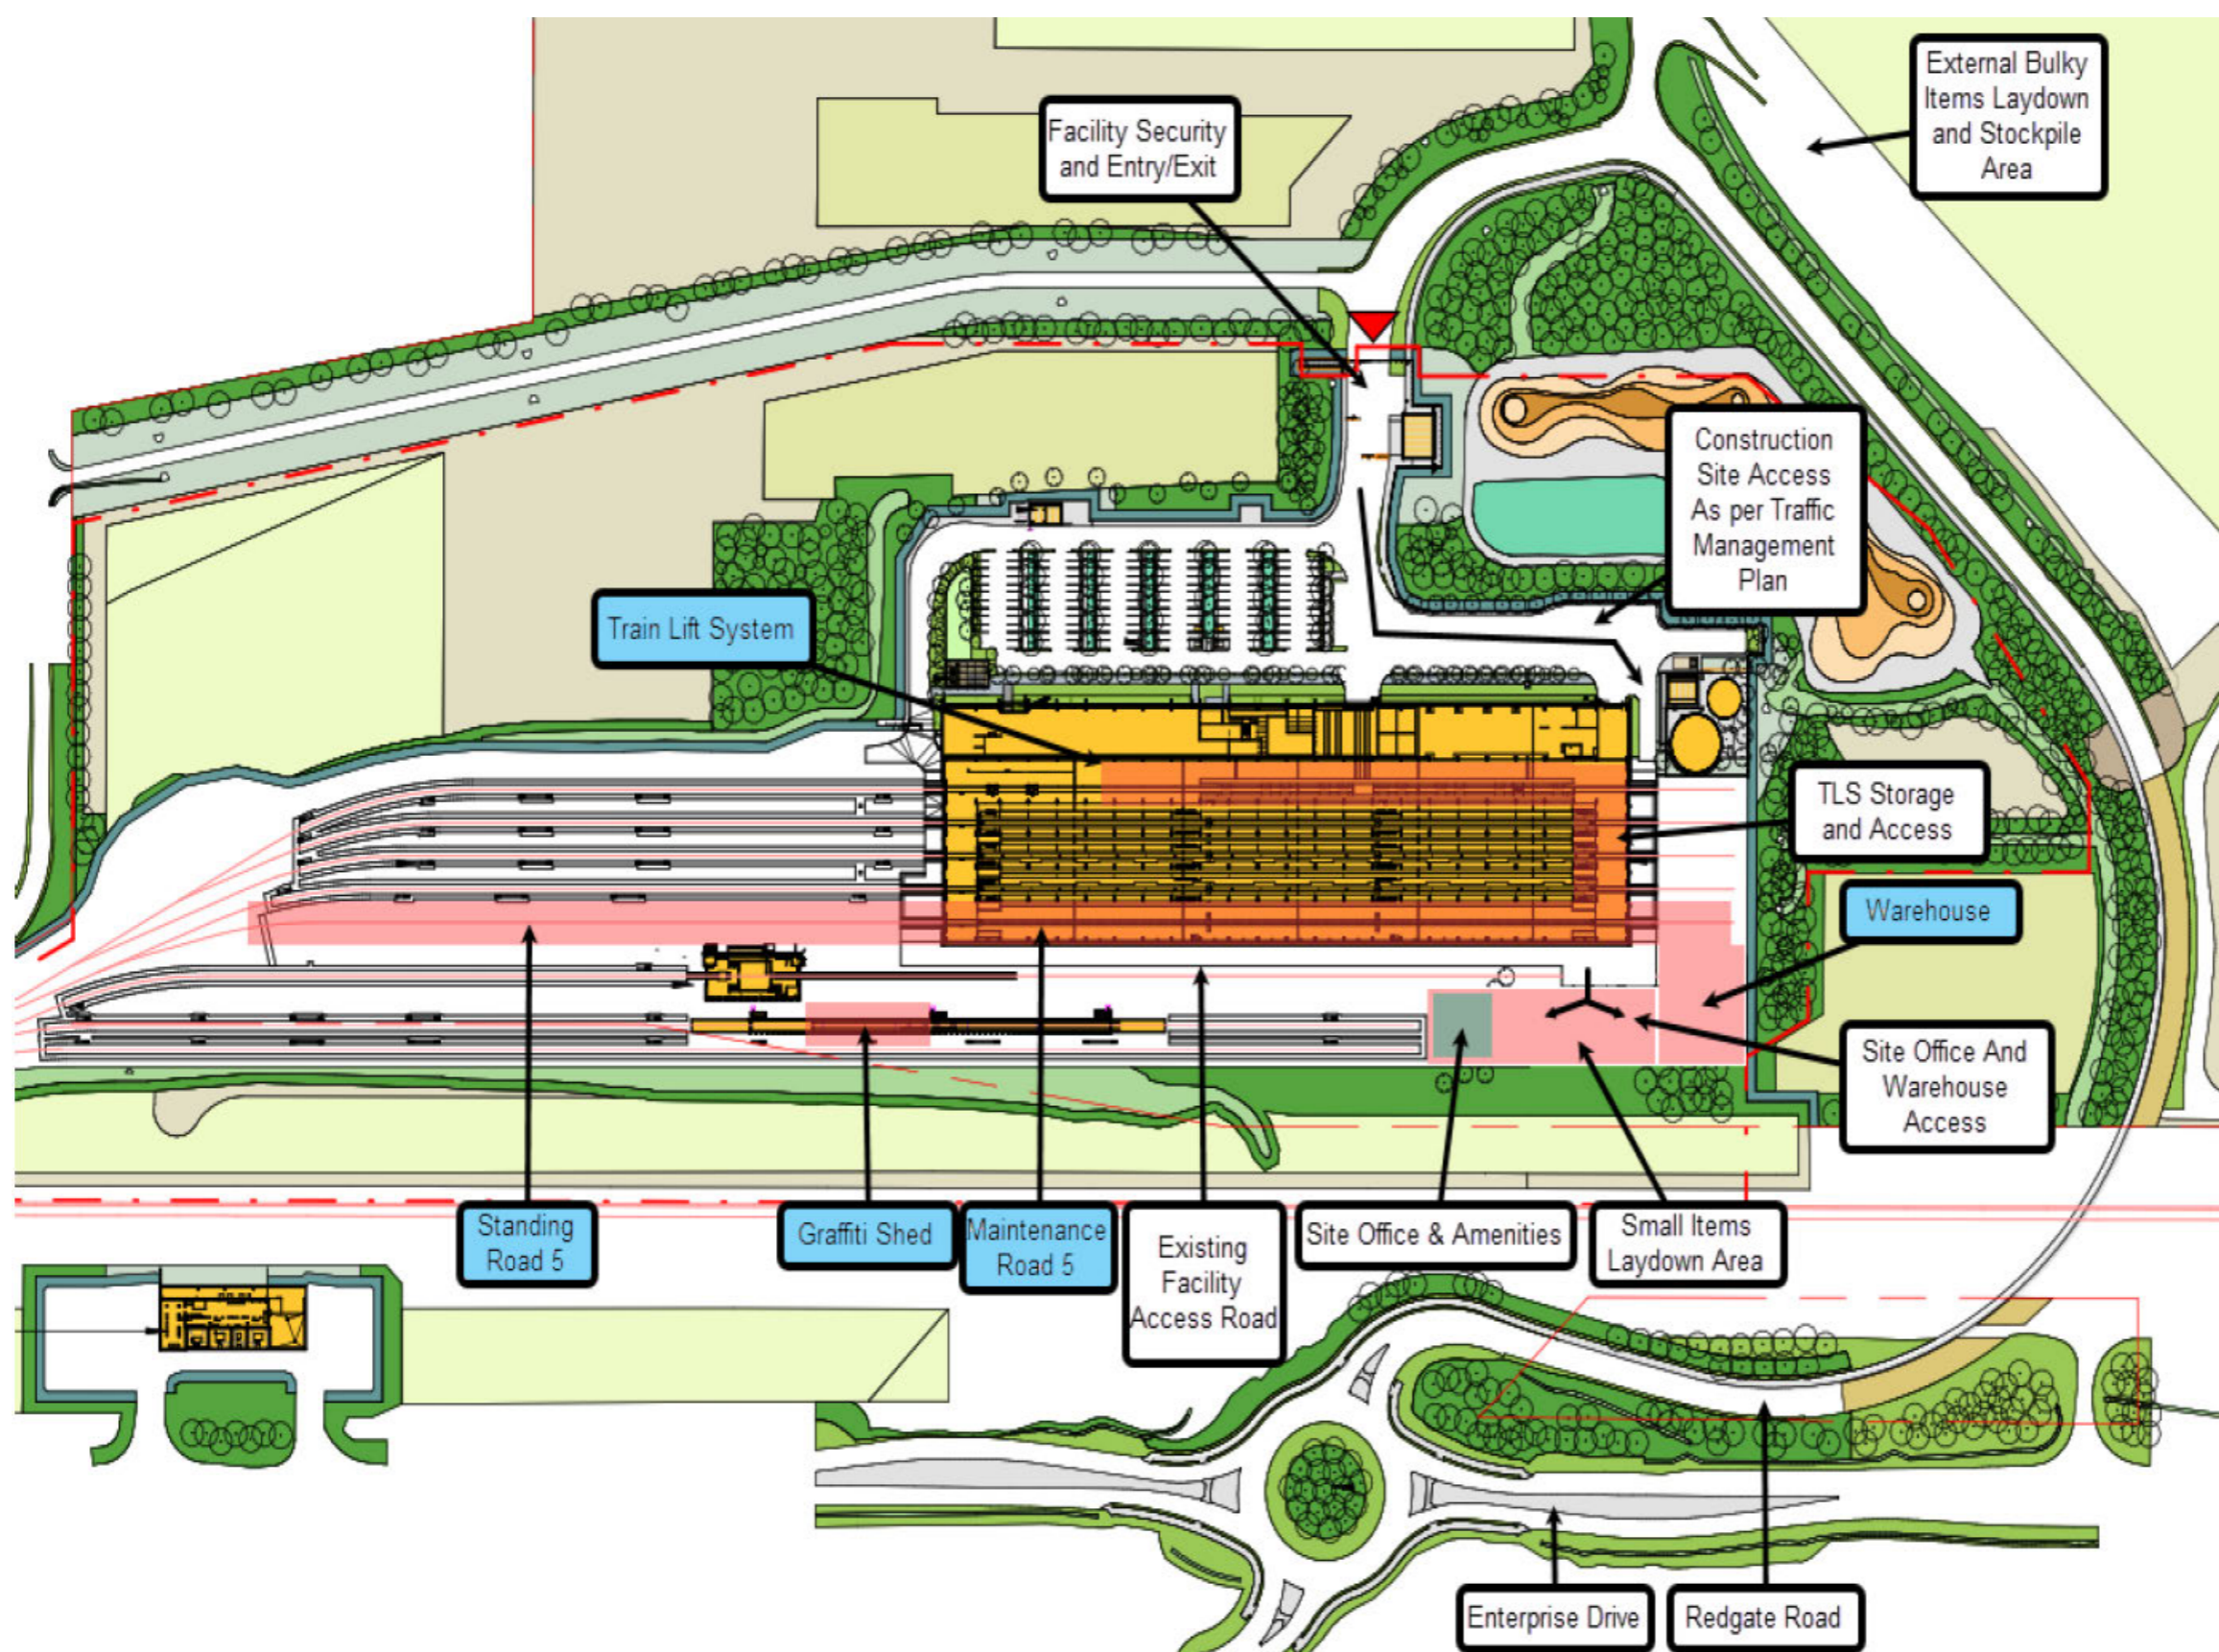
The existing and proposed site layout (Source: UGL 2022)
